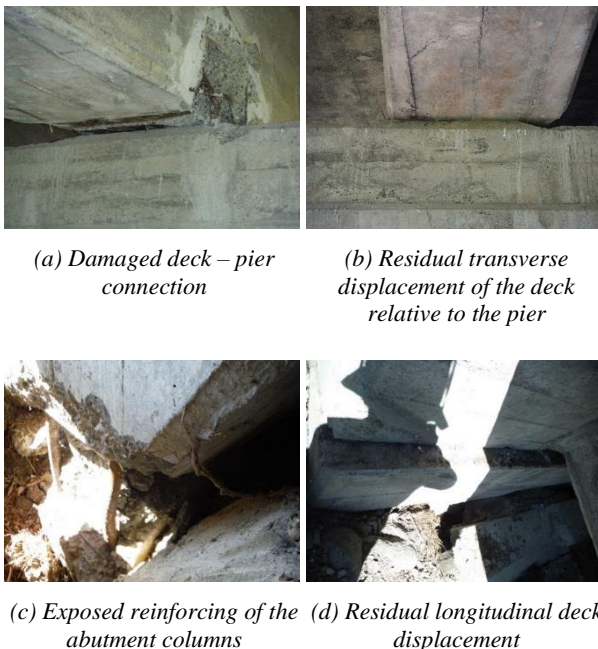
Abutment and superstructure damage at the Flaxbourne River Bridge.
